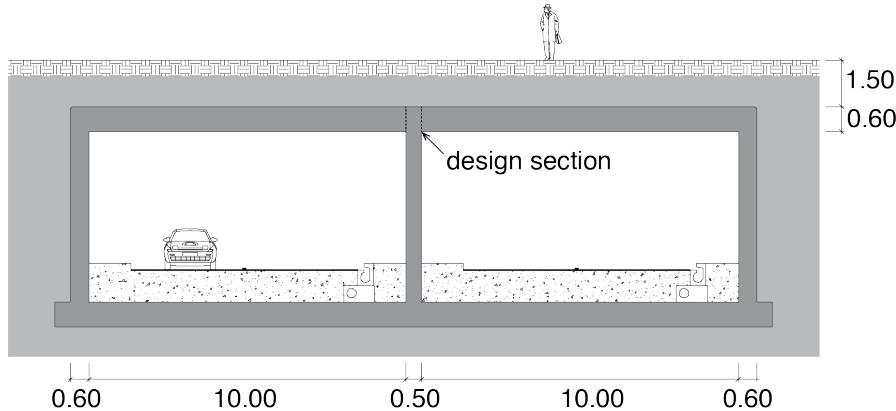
Cross section of the cut-and-cover tunnel segment. (unit [m])
